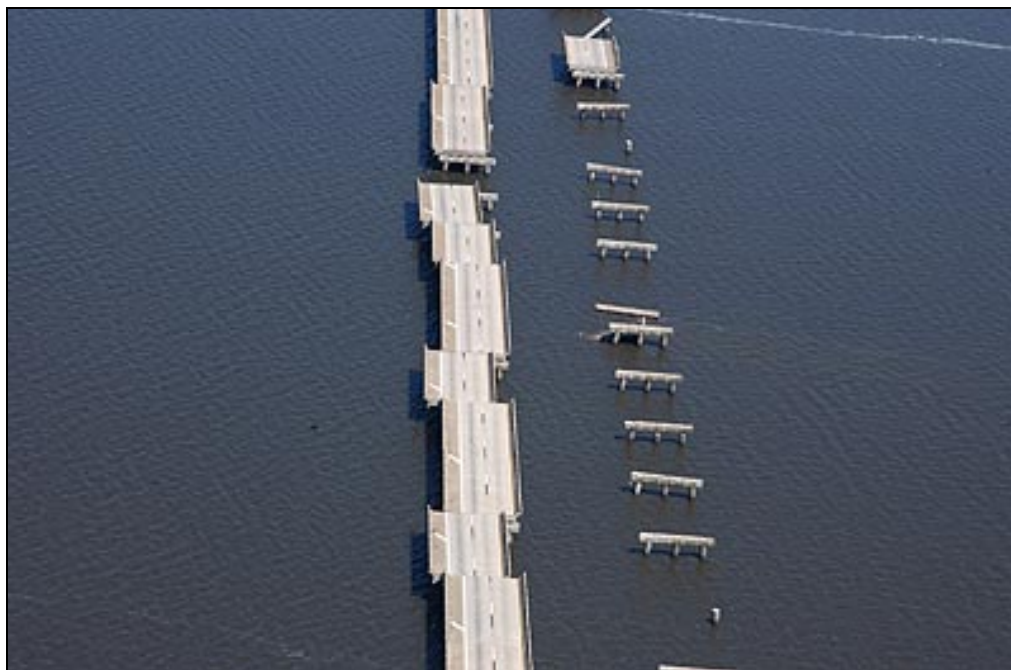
I-10 Bridge over Escambia Bay, Florida after Hurricane Ivan in 2004
